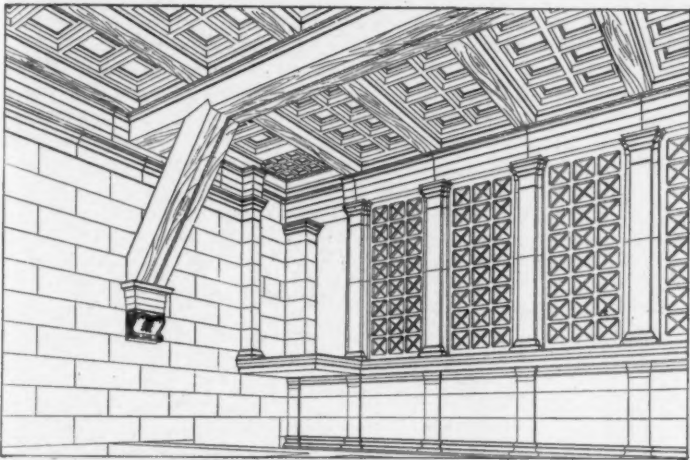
RECONSTRUCTION OF SOUTHWEST CORNER, SHOWING *Metopon*,
